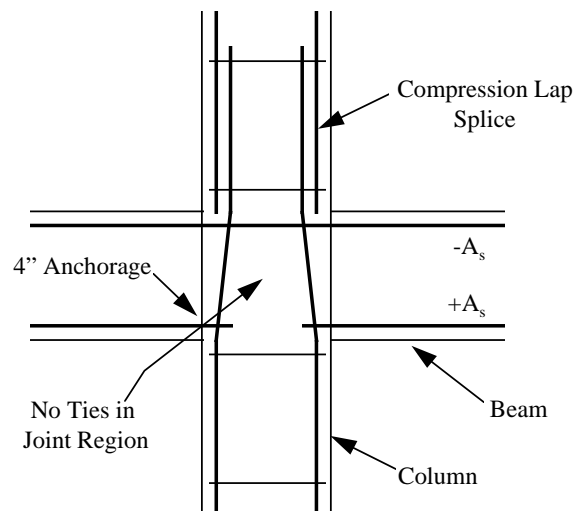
Beam-Column Joint in Test Specimen^[6]
